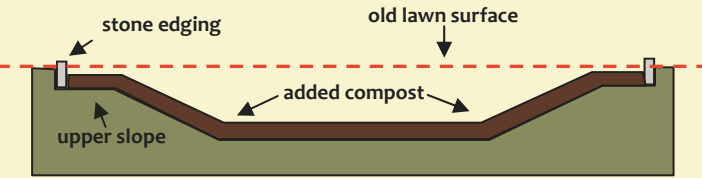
Level bed with sloping edges. This design requires more space. Only plants that can thrive in drier soil conditions can be planted on the upper slope of this type of rain garden; typical rain garden plants will not thrive here.
